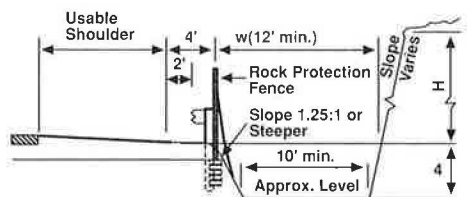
Roadway section on rock slope—Design A, Stage 3.
